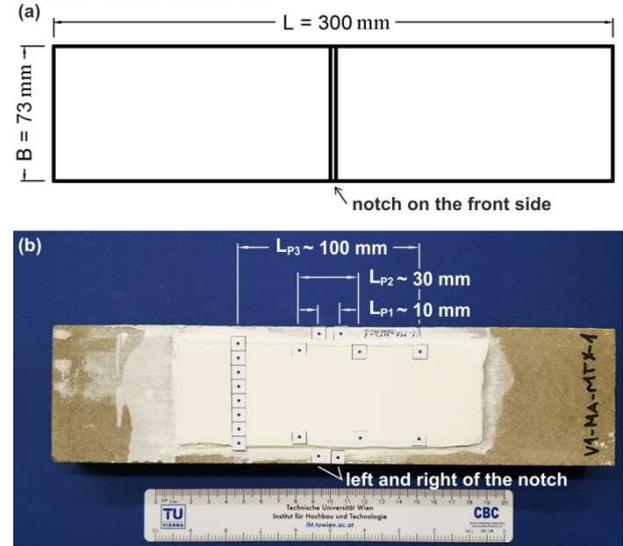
Shape and dimensions of the bending beams (a) and a bending beam ready for testing with point pattern (b) acc. to patent [16].
